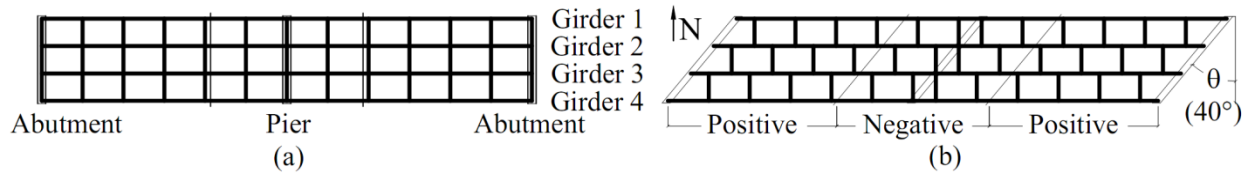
Plan view (a) Right, nonskewed bridge. (b) Skewed, staggered bridge.
